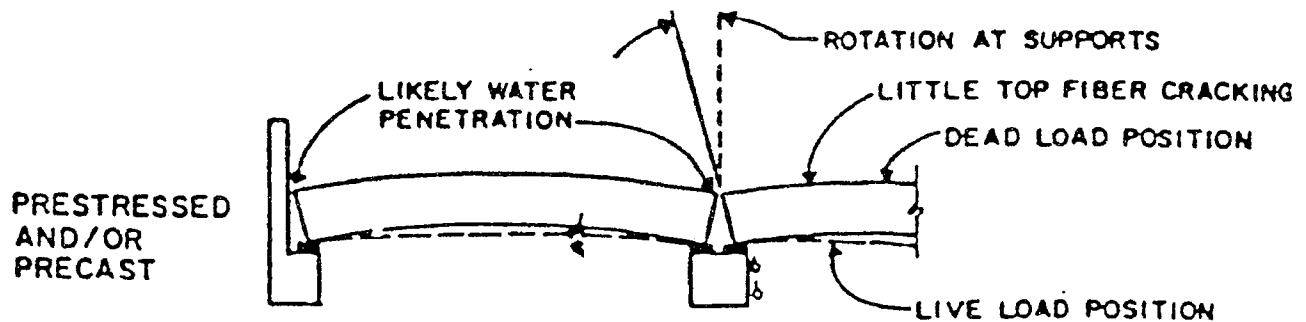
Schematic simple span slab construction under gravity loads (using prestressed reinforcement) [4]
